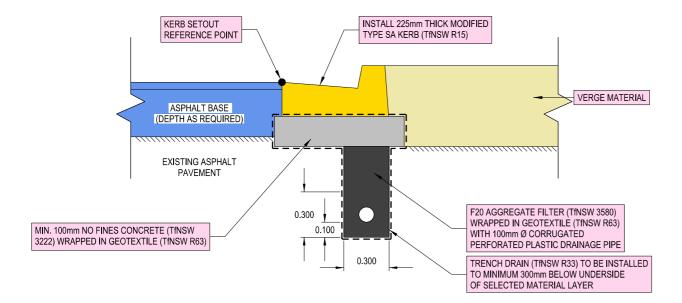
NO FINES CONCRETE AND TRENCH DRAIN UNDER CONCRETE KERB (PAVEMENT TYPE 1)
